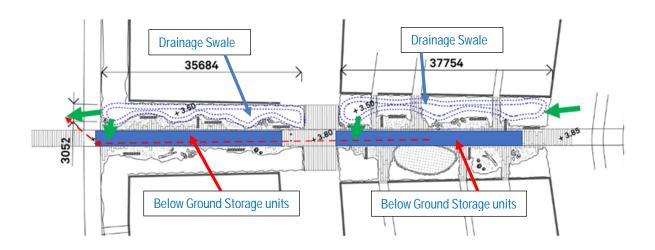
Stormwater Drainage Concept Plan – Showing drainage flow paths (piped & swales) and disposal routes incorporating biofiltration and & Storage.
